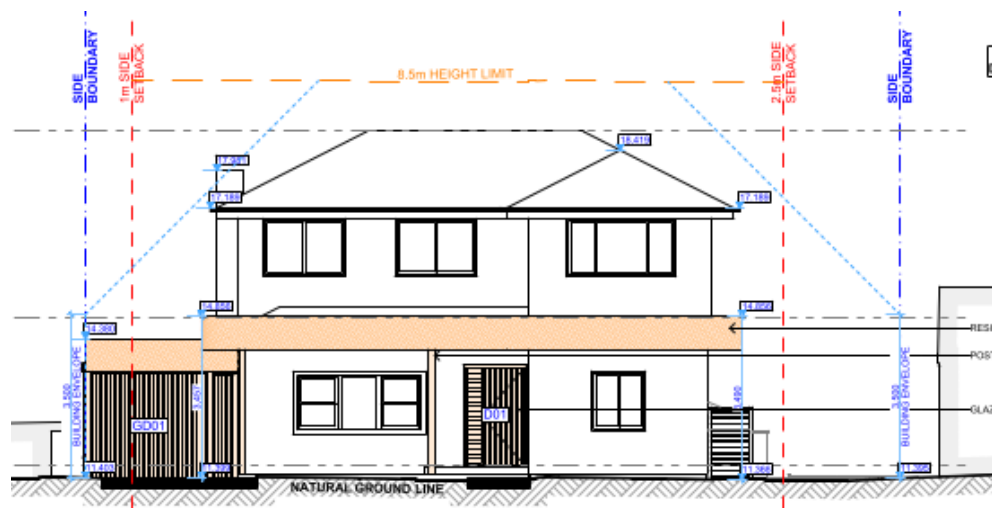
Plan Extract: South Elevation illustrating the building envelope
